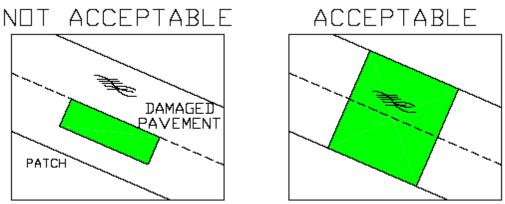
Example 10: Damaged pavement within 10 feet of a patch must also be patched.
